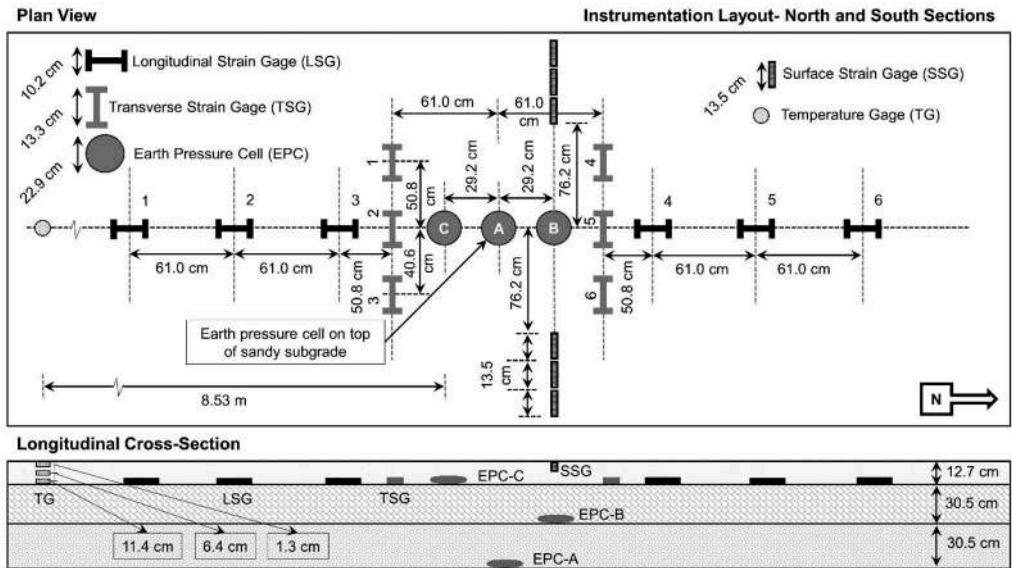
Layout of instrumentation in North and South sections of Test Cycle 1.
